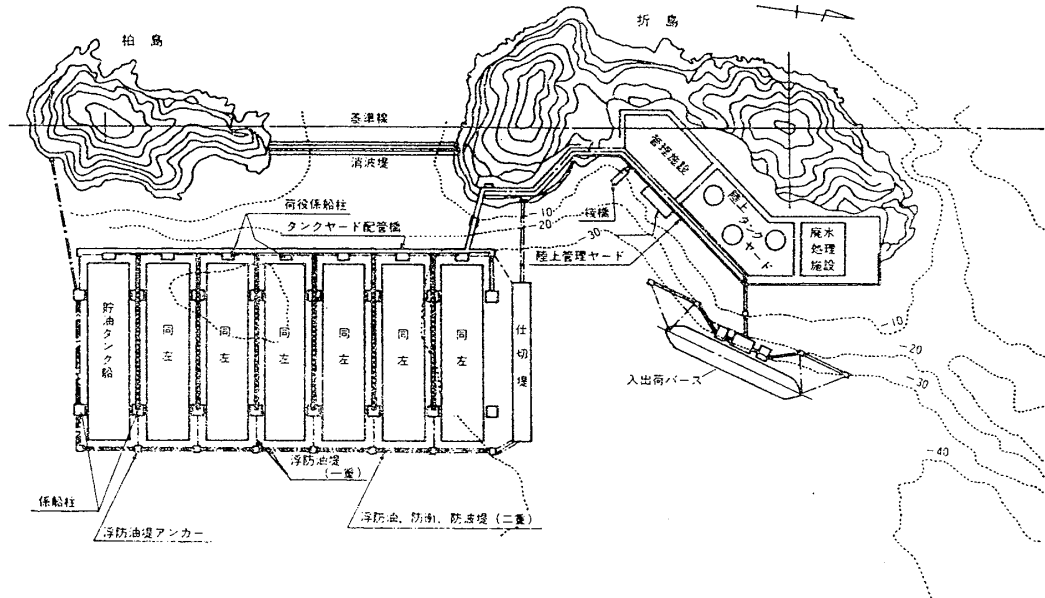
General layout of the Kami-Goto floating crude storage facility
